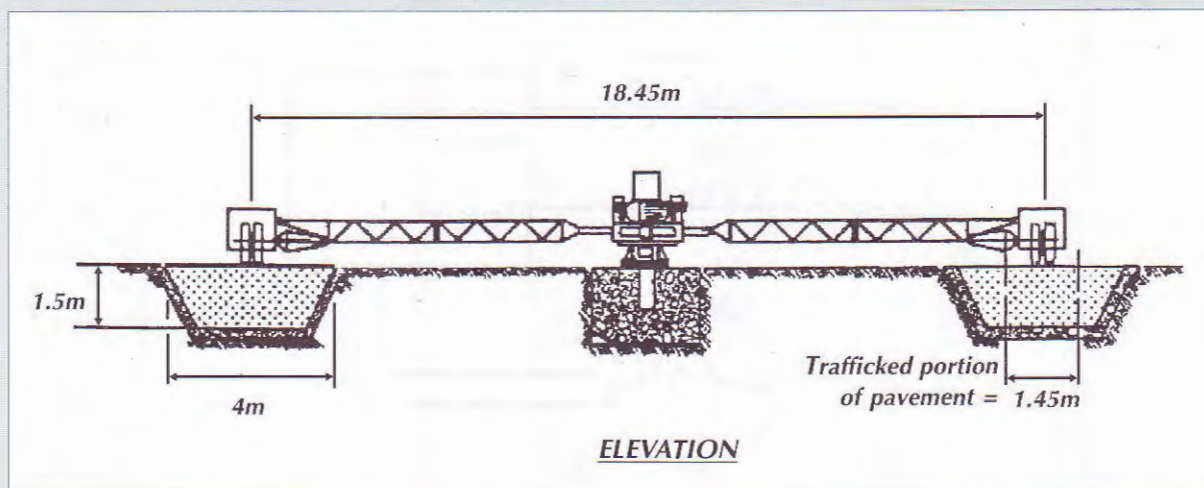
Elevation View of SLAVE and Cross-section of Pavement Tank
